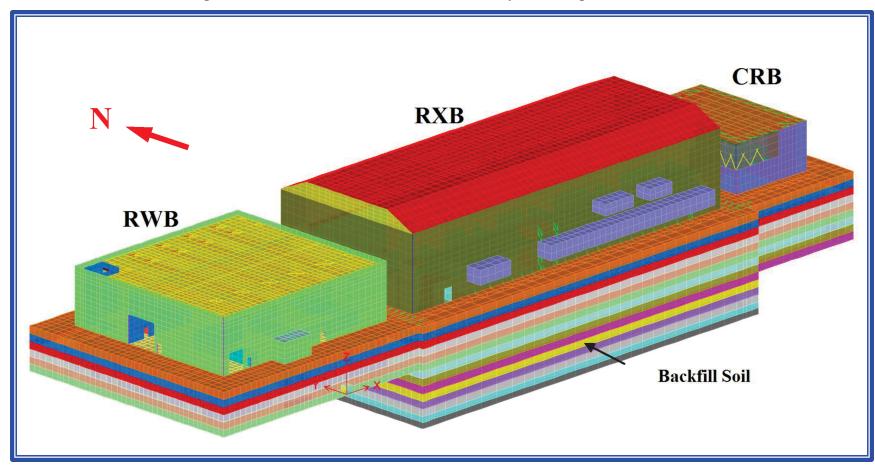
Isometric View of South Side of Triple SAP2000 Model (Looking Northeast)
